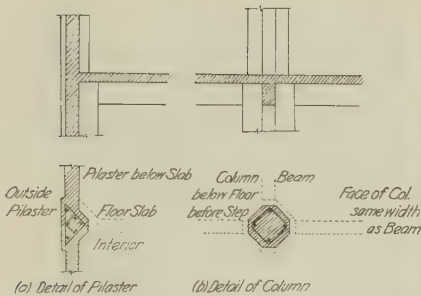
(ABOVE) DETAILS OF BUILDING CONNECTIONS
